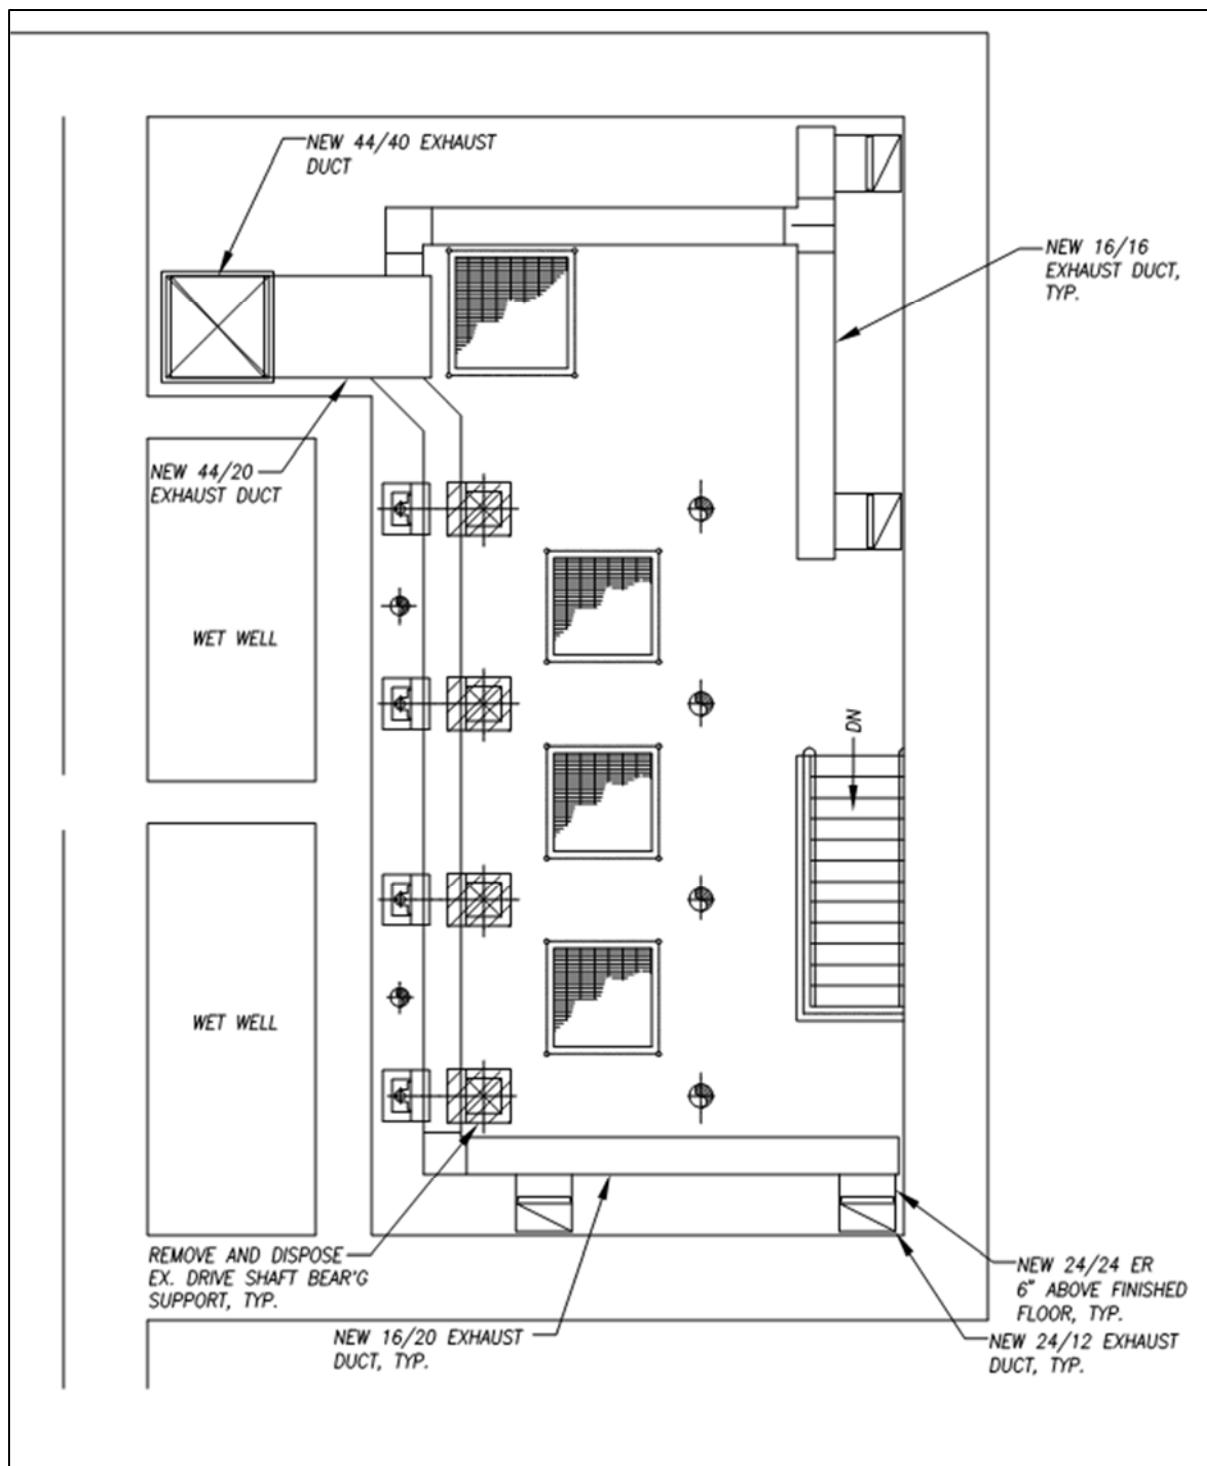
EPS with New Dry Pit Submersible Pumps (Variable Speed) – Intermediate Floor
